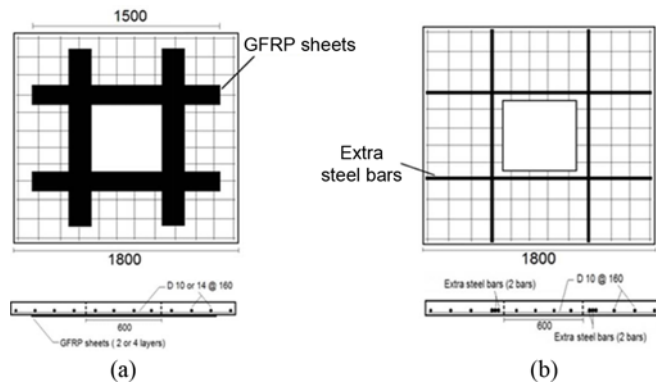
Strengthening Details: (a) GFRP Strengthened Slabs, (b) Steel Bars Strengthened Slab
